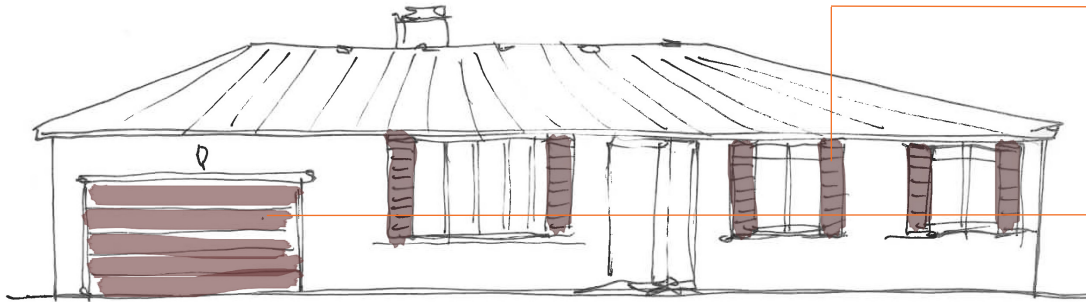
Sketch of Typical Residential Buildings along McCaffery's Lane.
